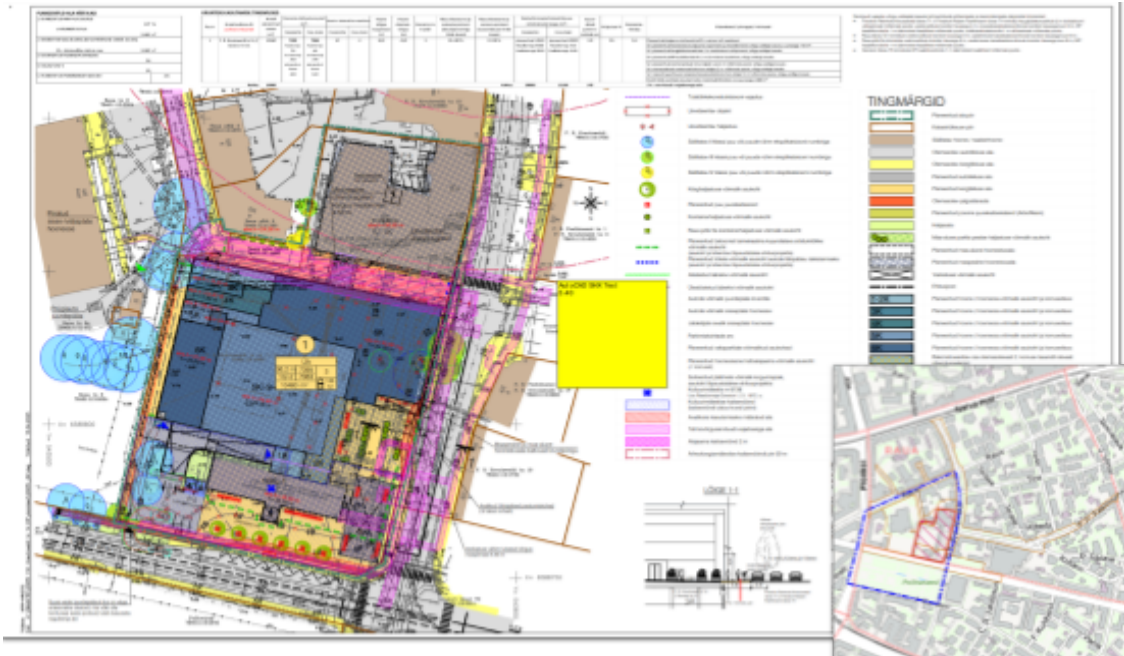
Detailed Plan map of National Broadcasting Building and Detailed Plan Area
